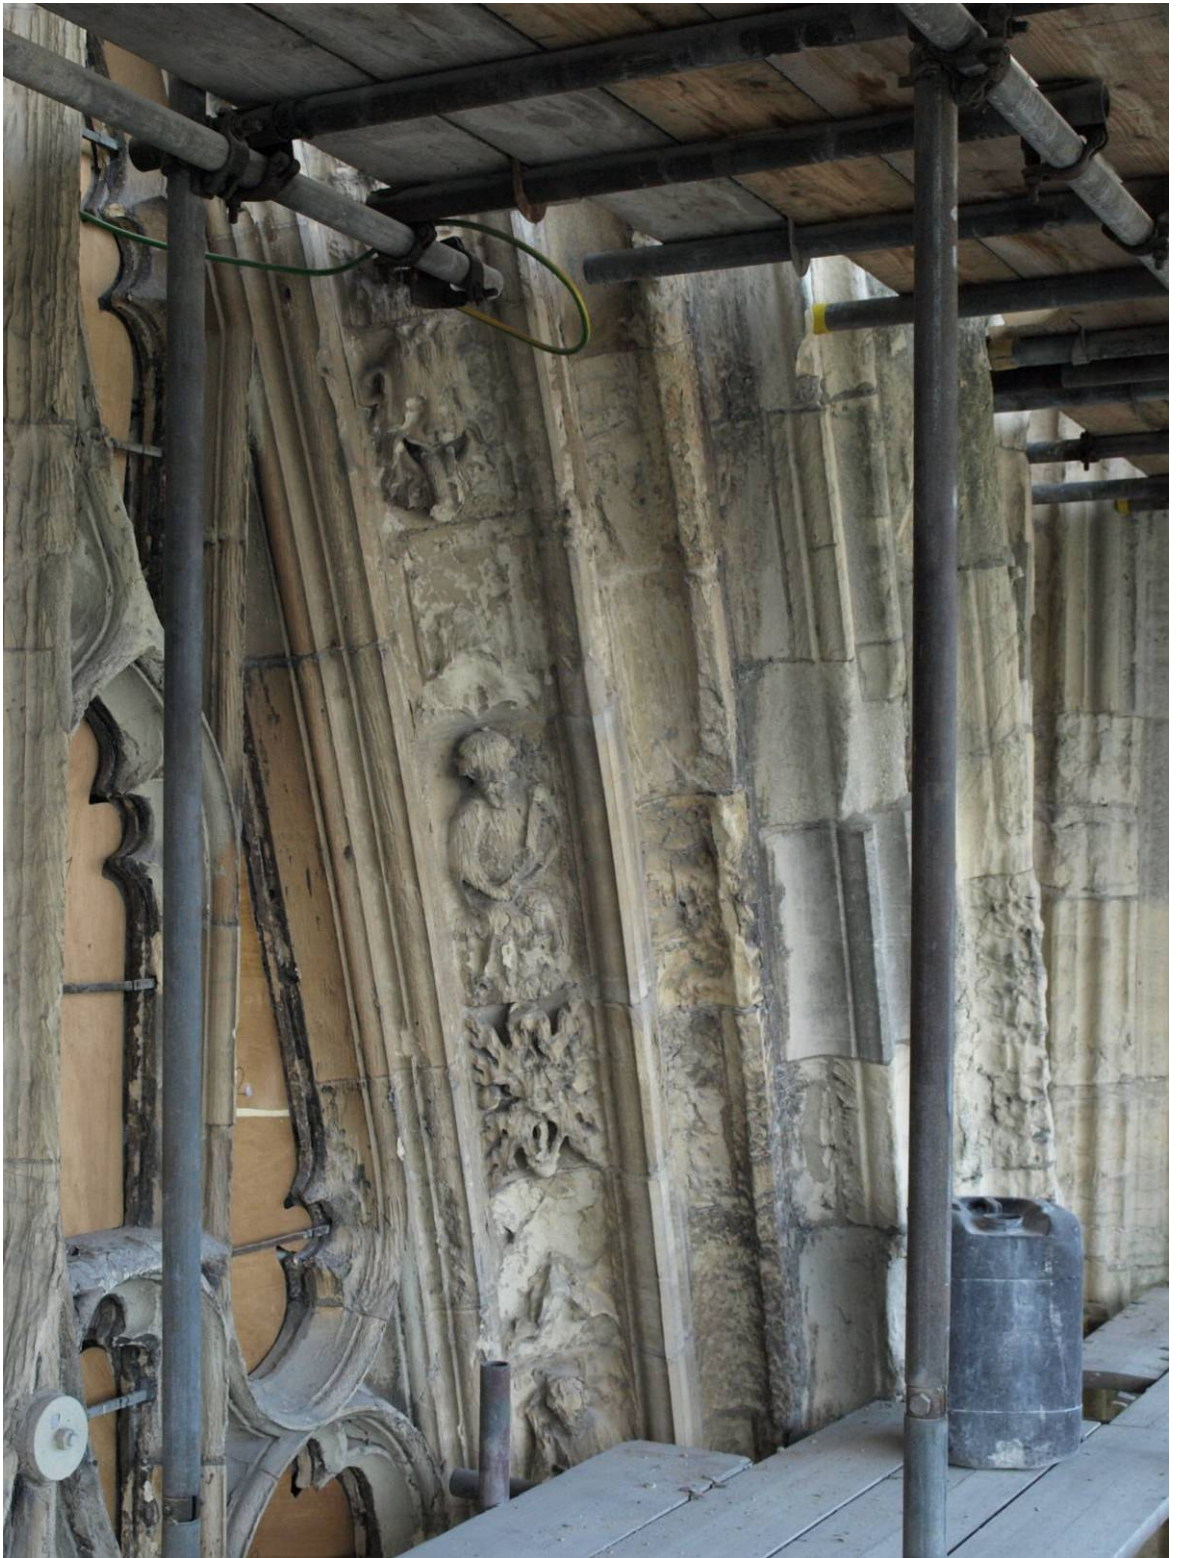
Great East Window, north side of arch showing decayed voussoirs adjacent to zones of substantial replacement of arch stones, indicating previous failure
